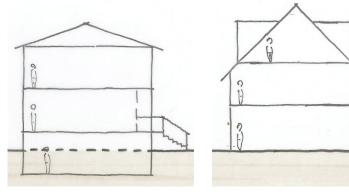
Examples of different ways to achieve a 2.5 storey infill building (See policy 8.11.11).
